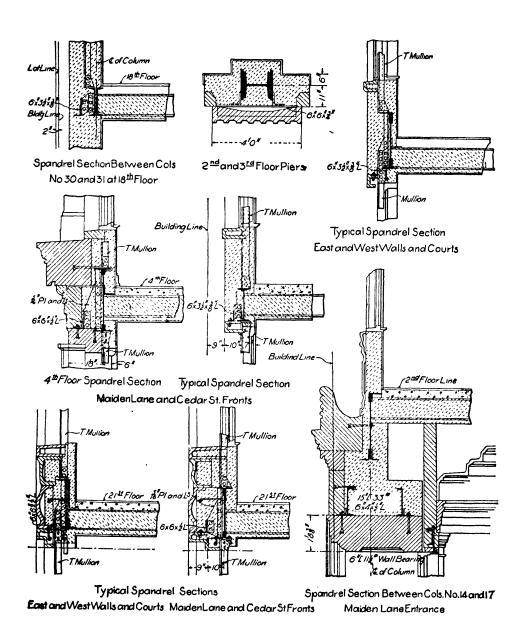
Details of Wall Construction, United Fire Company's Building, New York. (Eng. Record, Dec. 9, 1911.)
